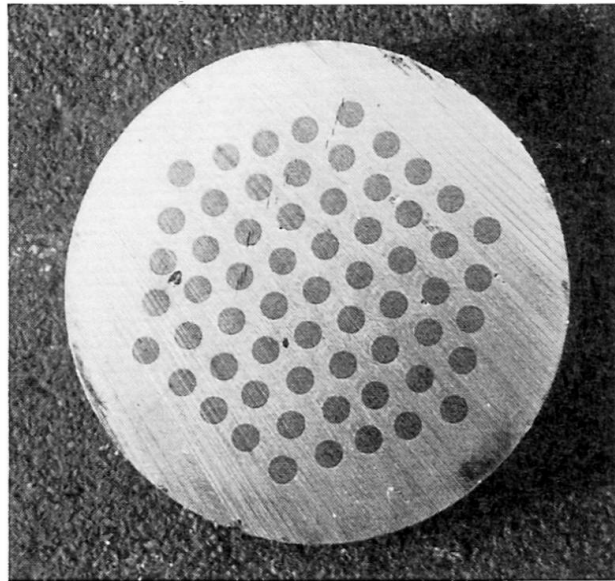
Zinc Alloy Cast Cone; Section showing the uniform Wire Arrangement
